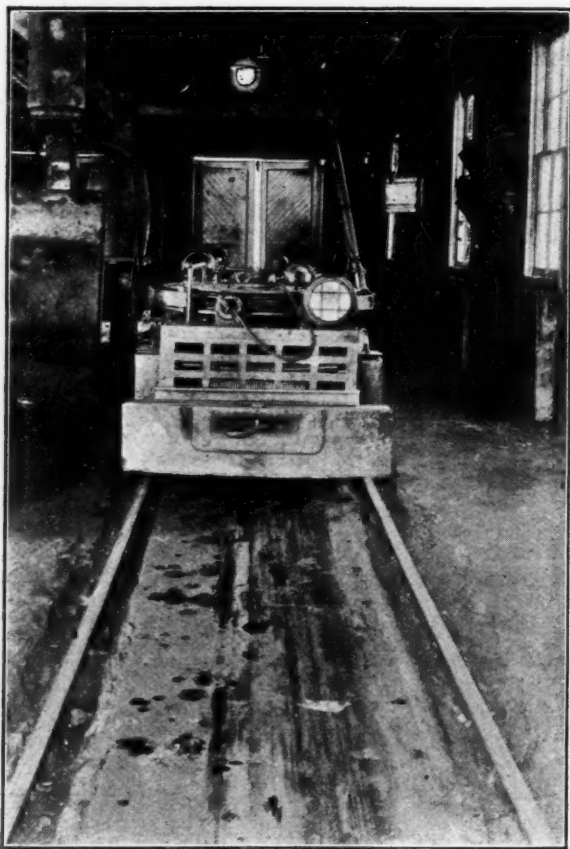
HOW NOT TO LAY CONCRETE FLOORS IN MOTOR BARN
